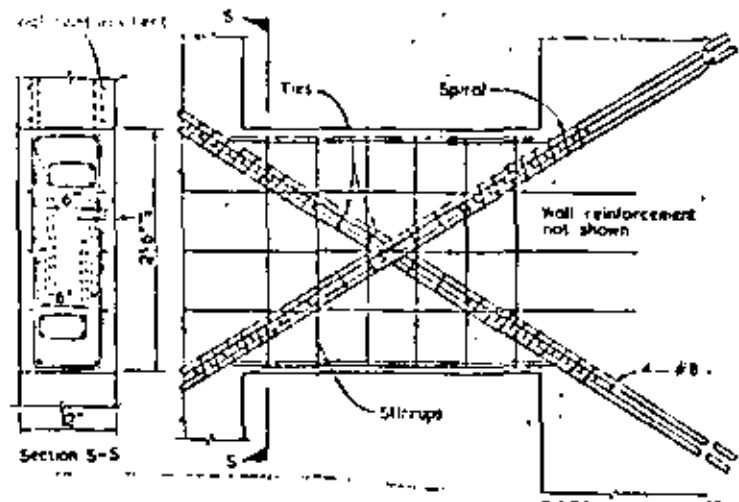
Suggested reinforcement for coupling beam (after Paulay²⁴)
